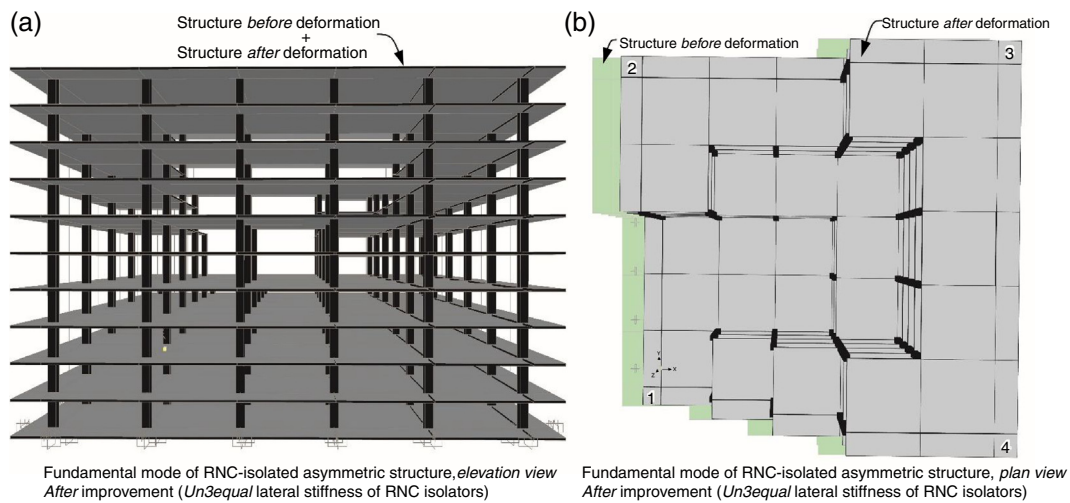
Fundamental mode of vibration of the RNC-isolated asymmetric structure after improvement: (a) elevation view; (b) plan view.
